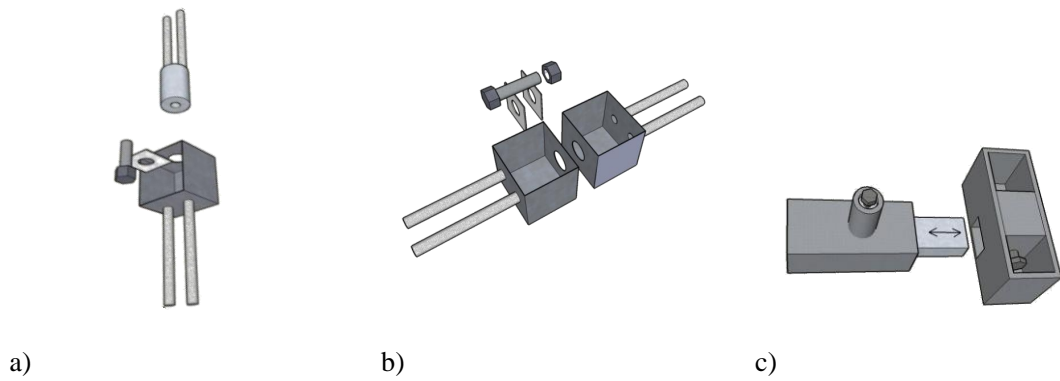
Including connection devices: a) wall-to-floor, b) wall-to-wall/ floor-to-floor and c) floor-to-floor device in case of big shear forces.
